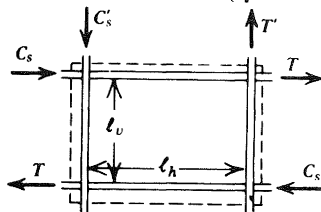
FORCES CAUSING HORIZONTAL SHEAR FORCE IN BEAM-COLUMN JOINT CORE
